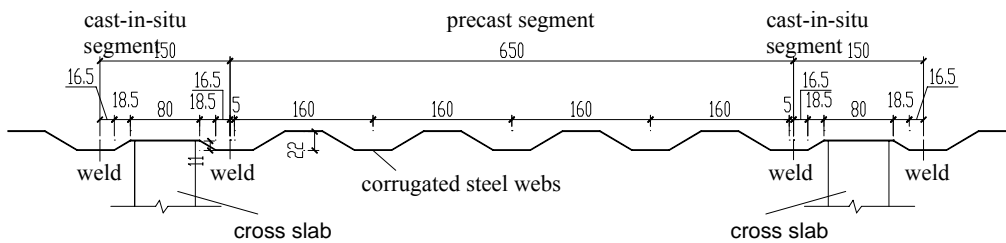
The tied beam corrugated steel webs (unit: cm)
